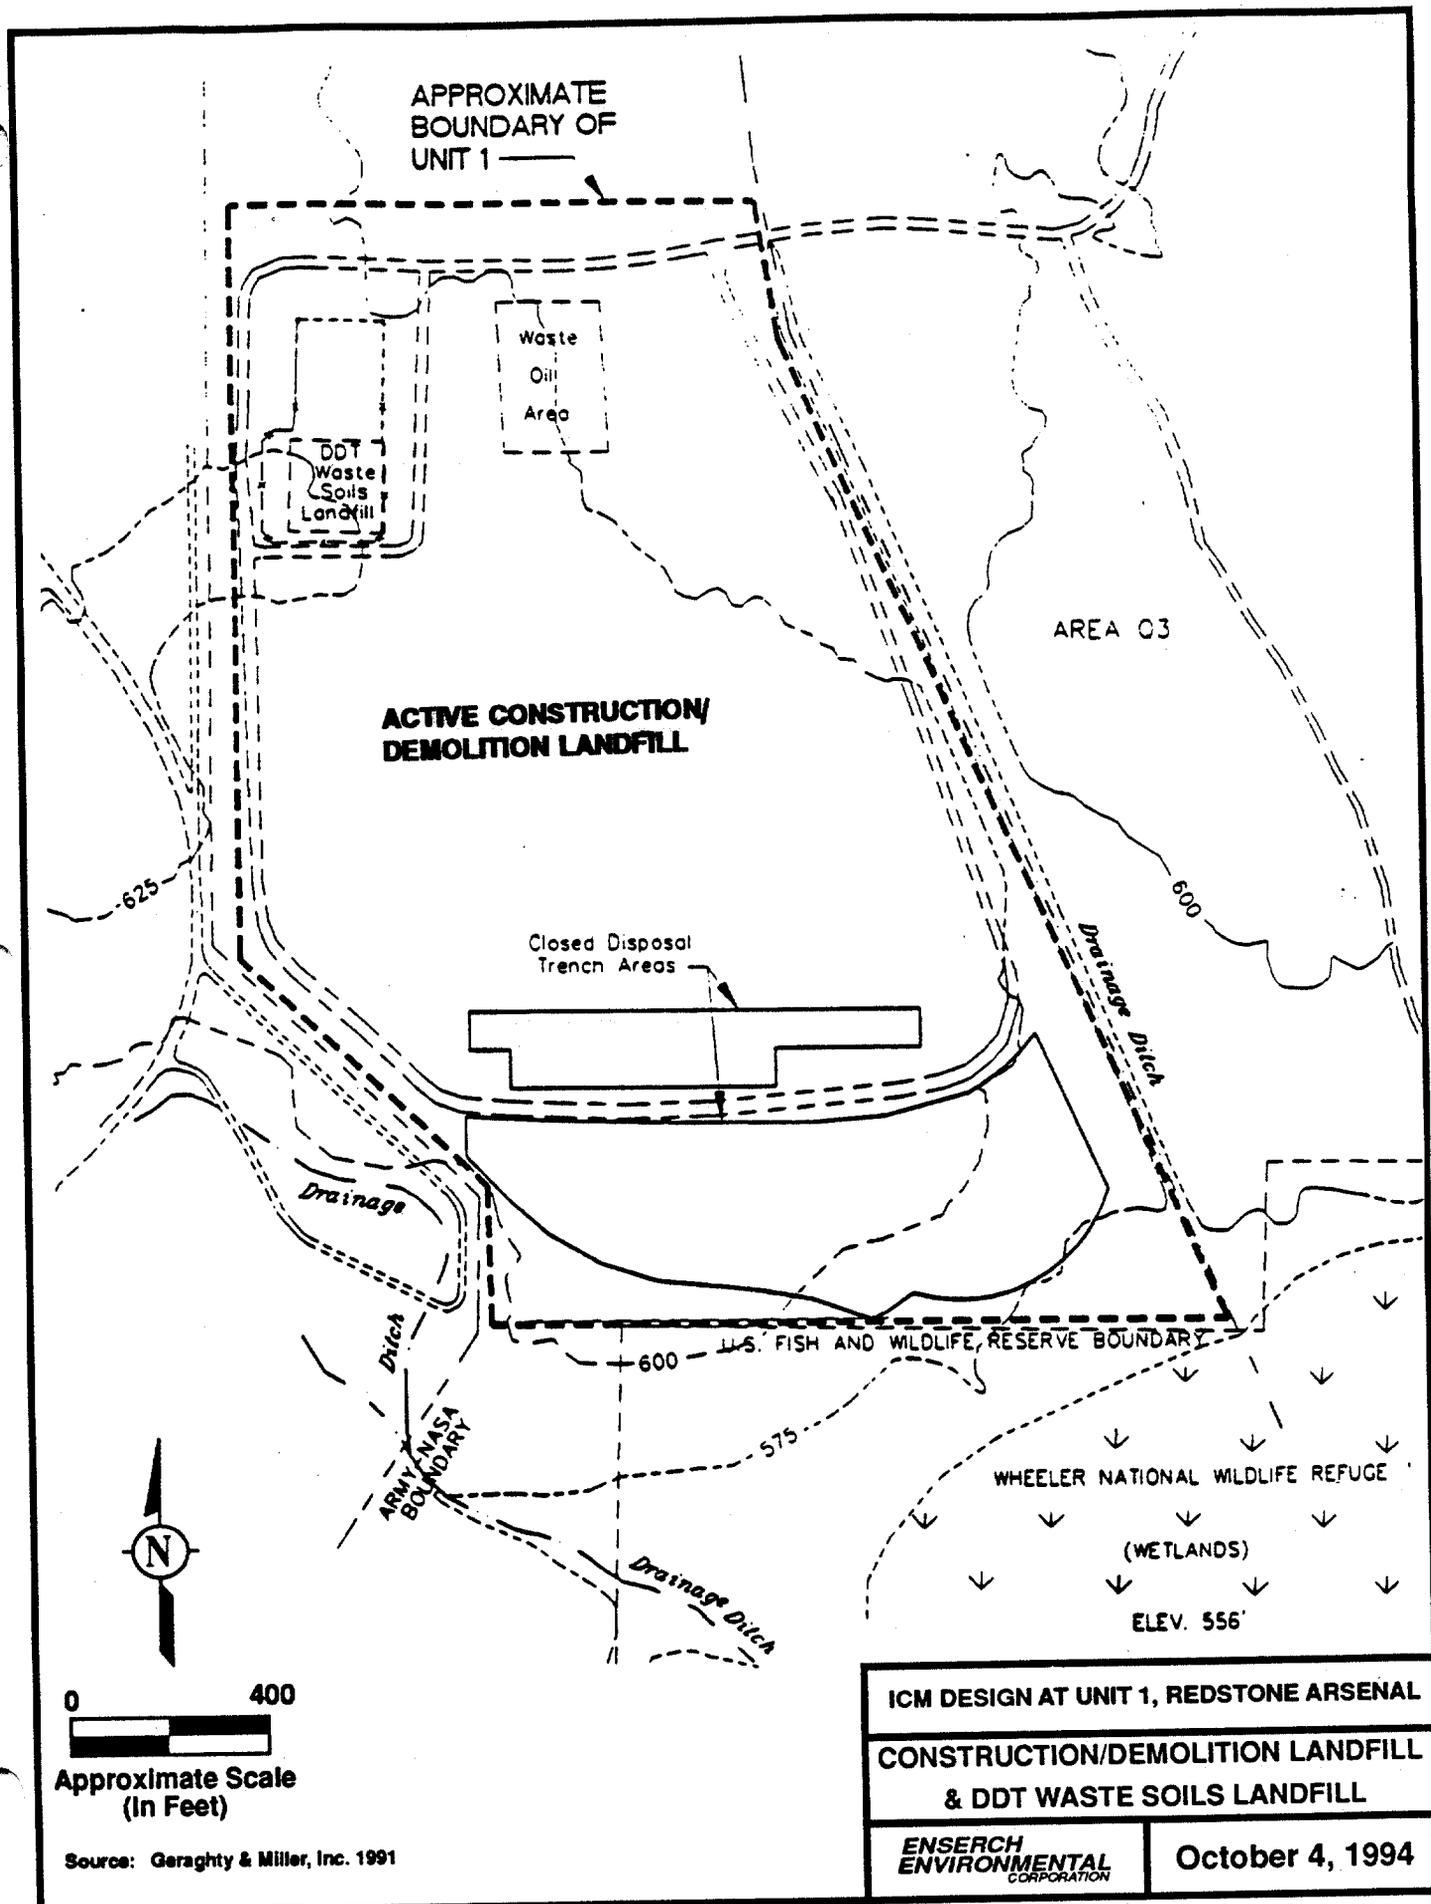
CONSTRUCTION/DEMOLITION LANDFILL & DDT WASTE SOILS LANDFILL
